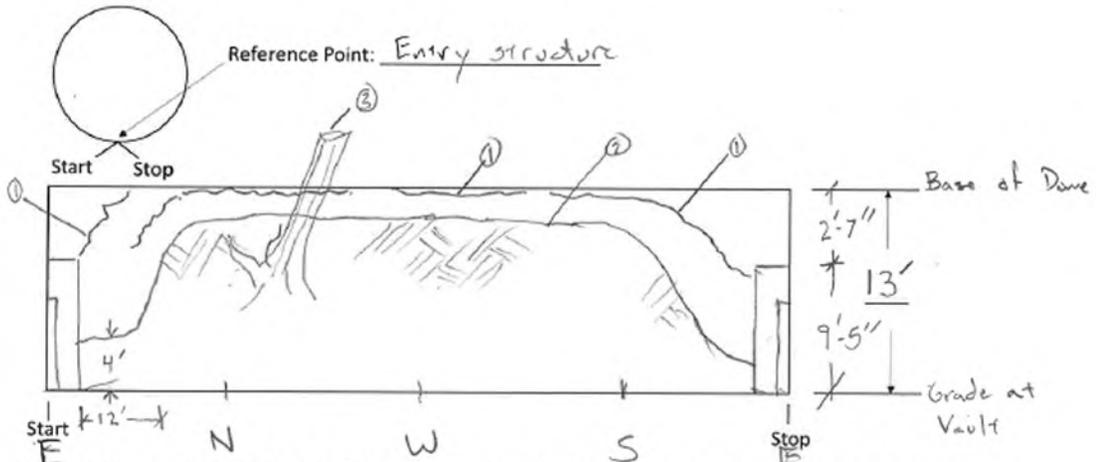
Reservoir EXTERIOR WALL Elevation- Note location of ladders and other features.
